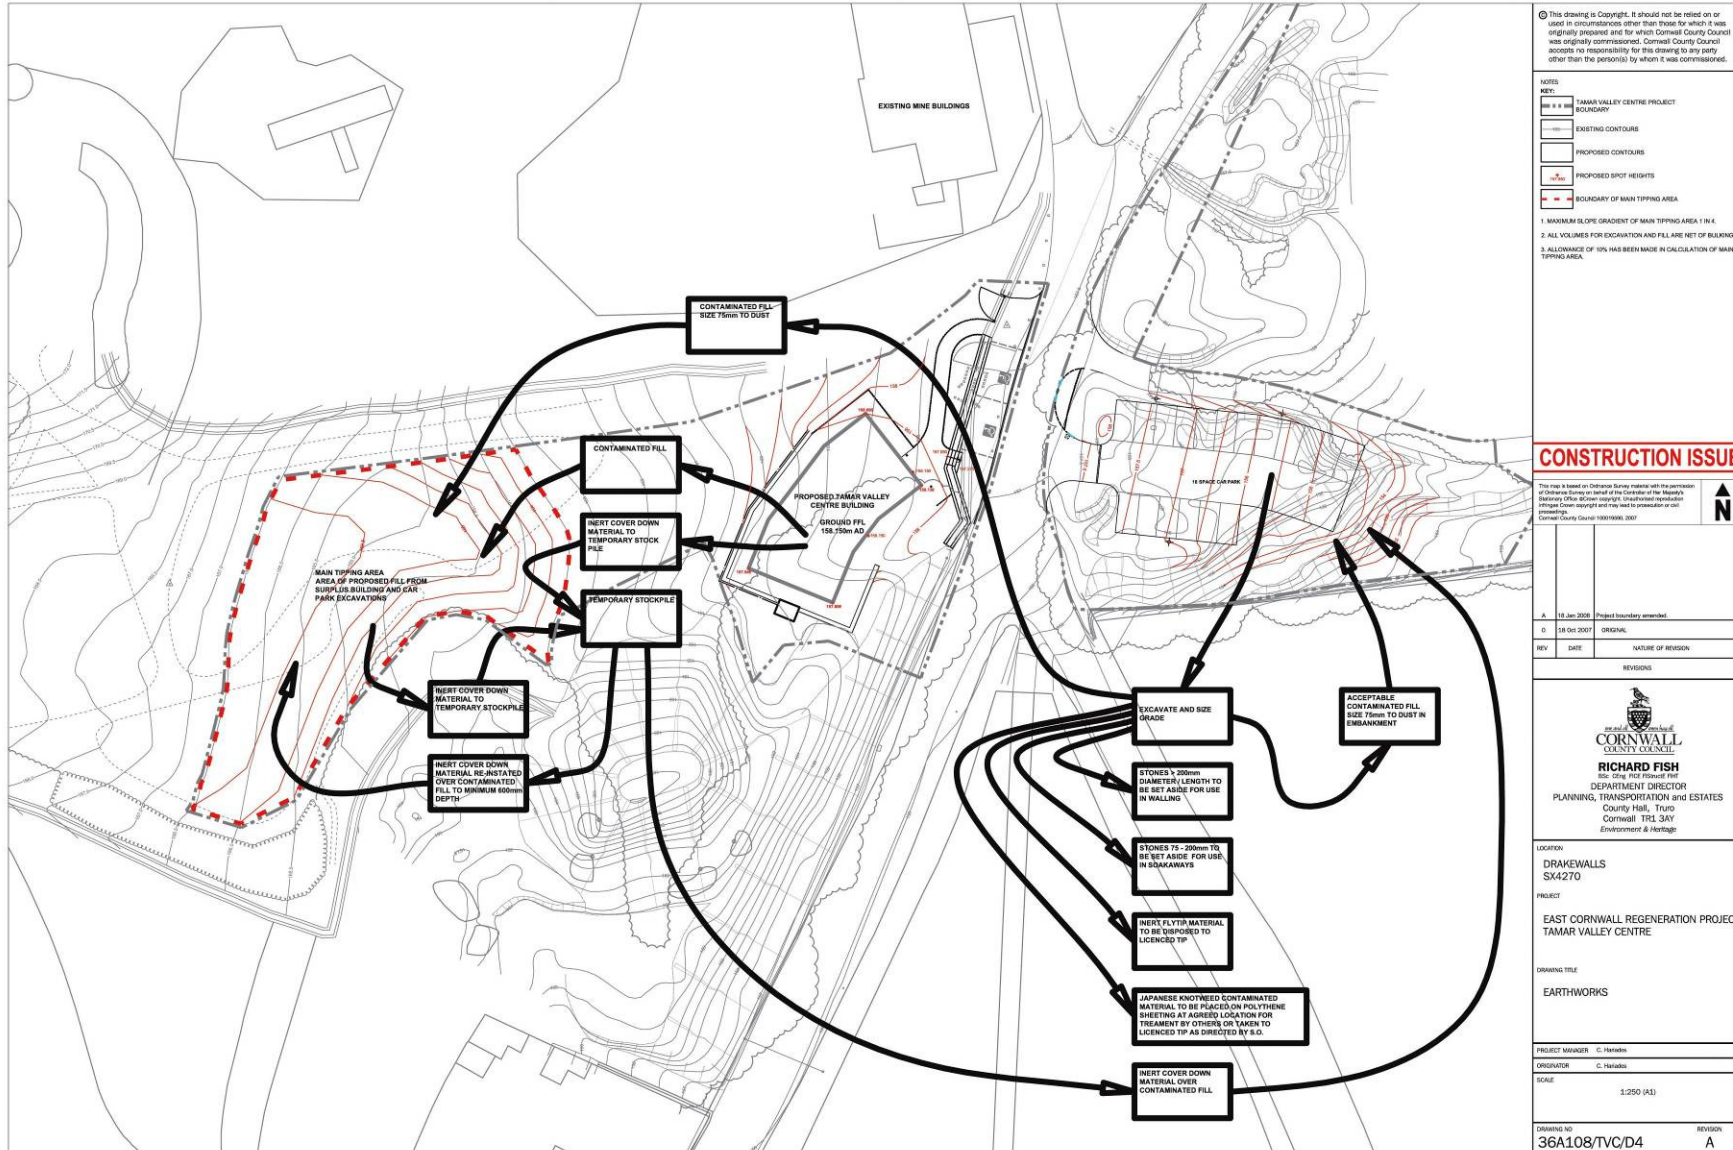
Tamar Valley Centre earthworks site plan (CCC 36A108/TVC/D4 Rev A)
